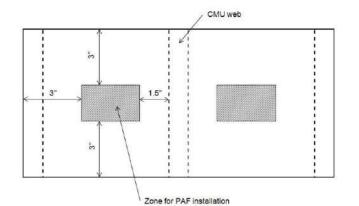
ZONE FOR FASTENER INSTALLATION IN FACE SHELL OF CMU
